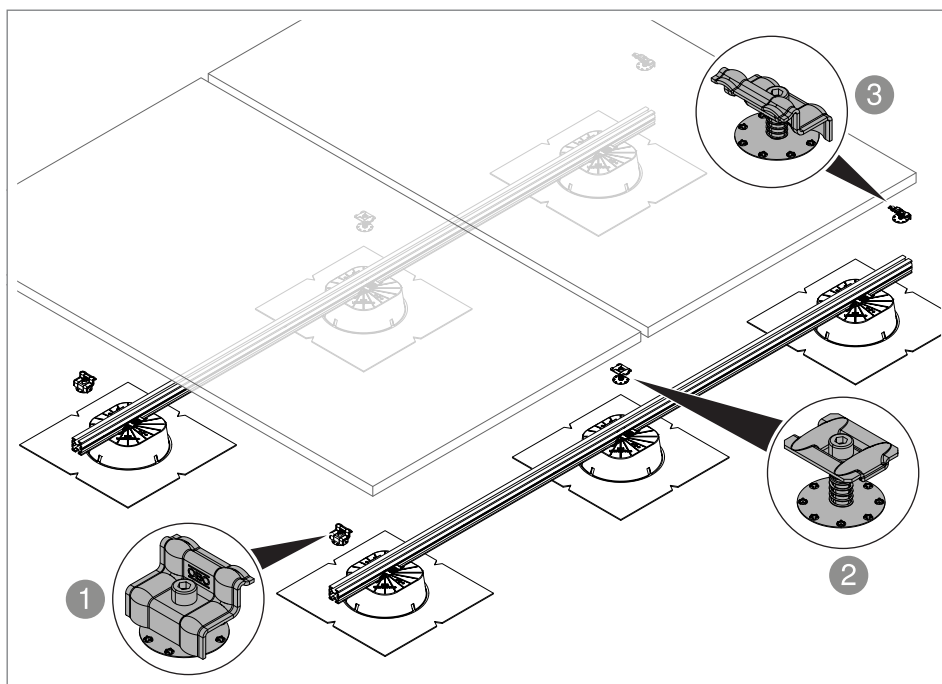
Screwing in the universal clamp as an end clamp on the right
